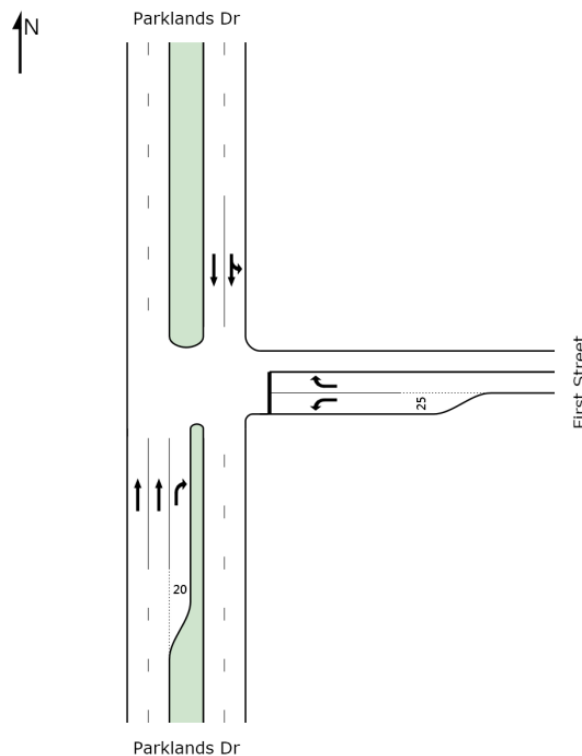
Parklands Drive / First Street – SIDRA Intersection Layout
